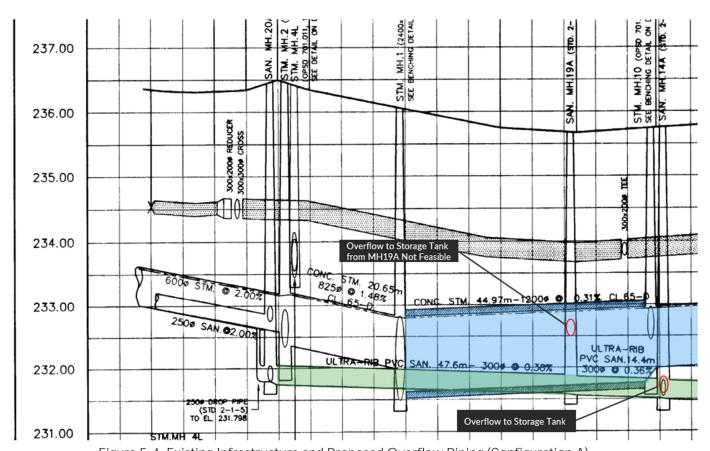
Existing Infrastructure and Proposed Overflow Piping (Configuration A)
